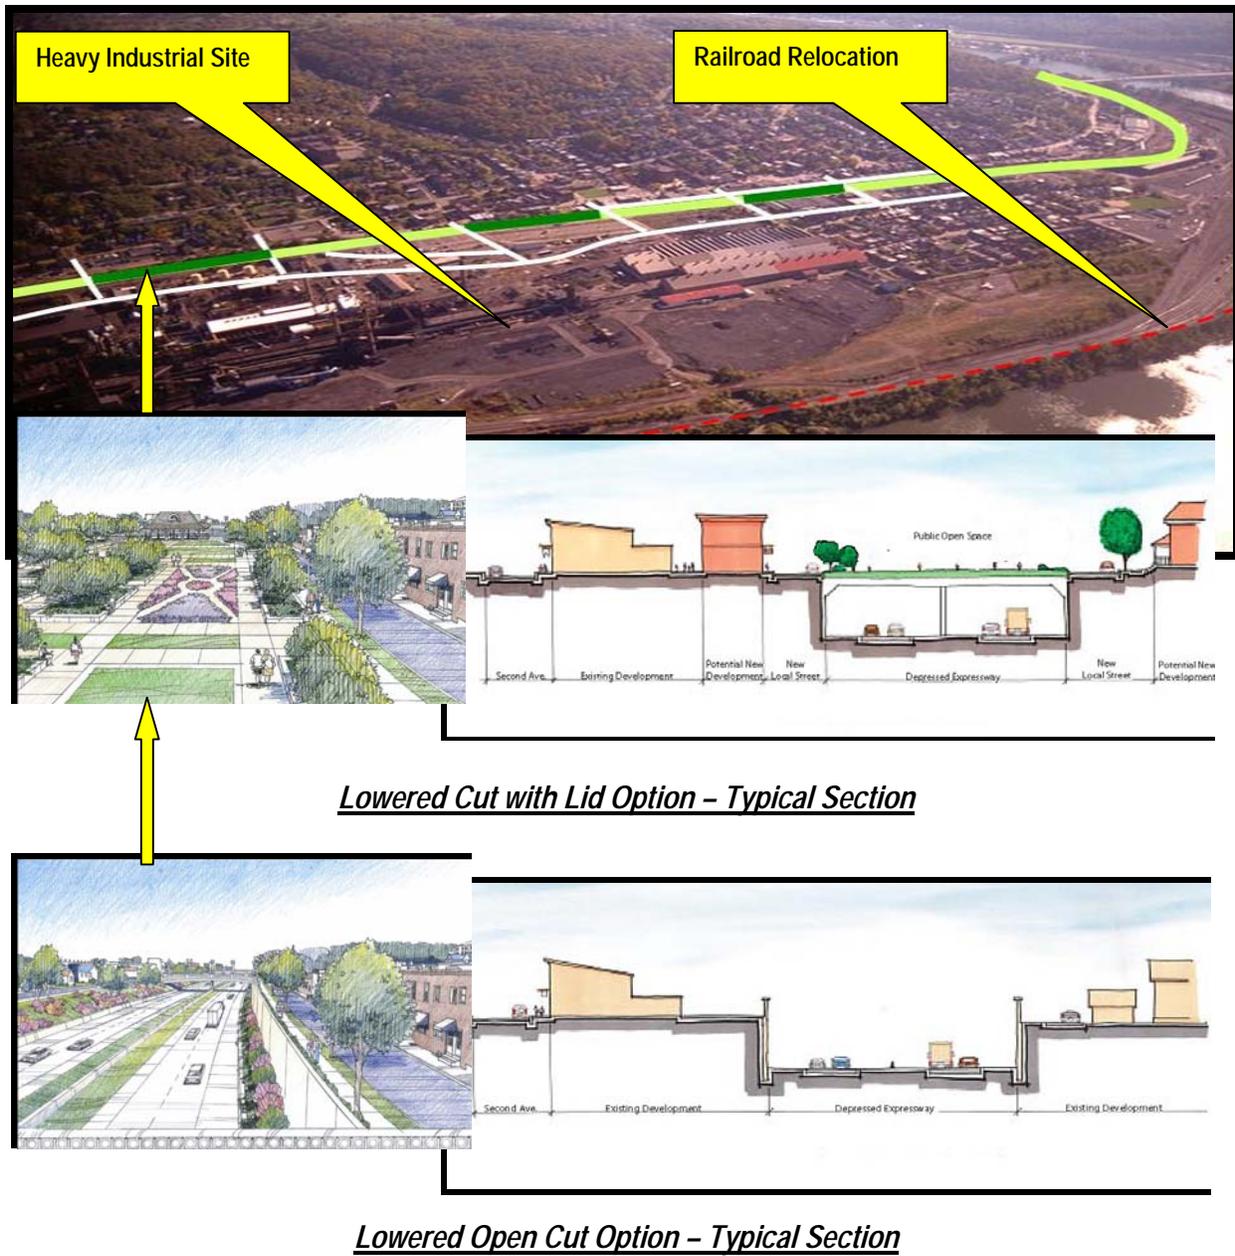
Section 53E – Monongahela River Bridge To Turtle Creek And Braddock Avenue
